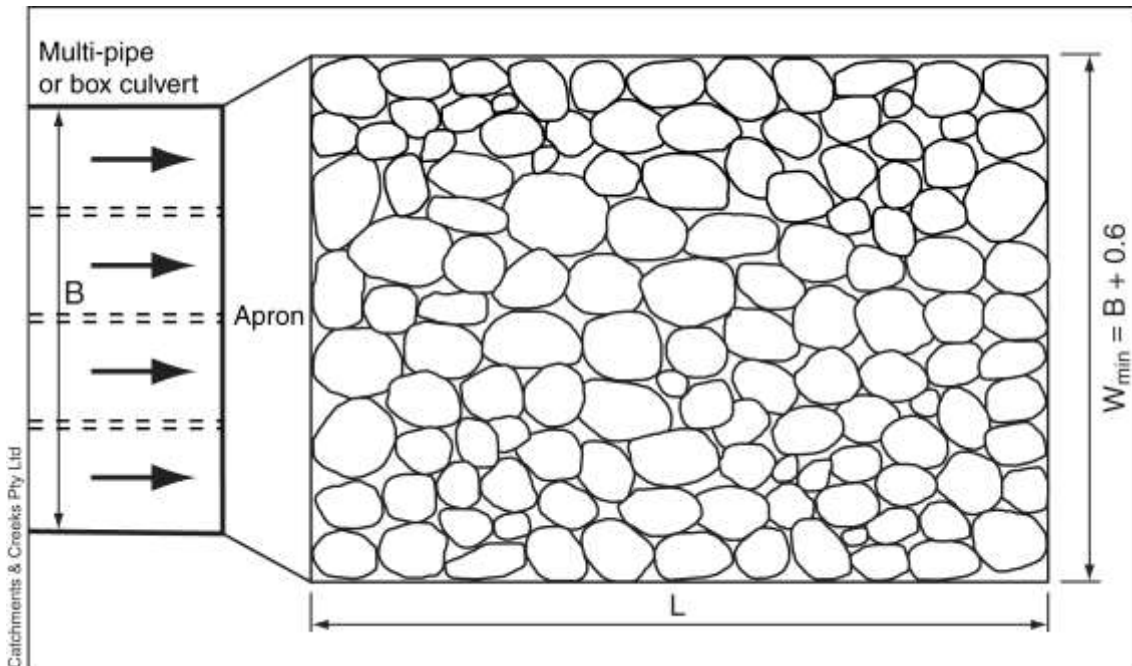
Typical layout of a rock pad for multiple pipe and box culverts (plan view)
